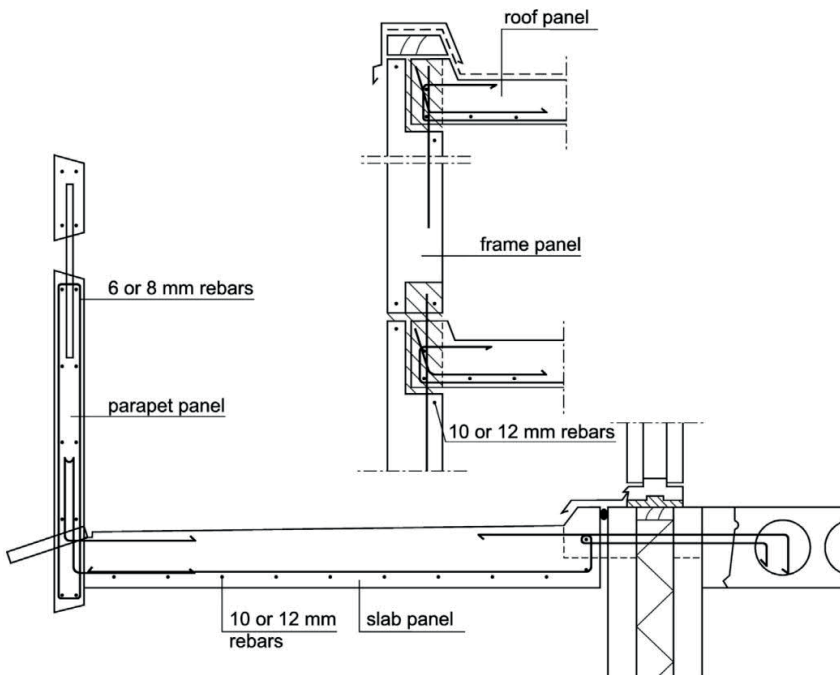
Cross-sections of typical precast balcony elements and their joints to the building frame. (Pentti 1994)
